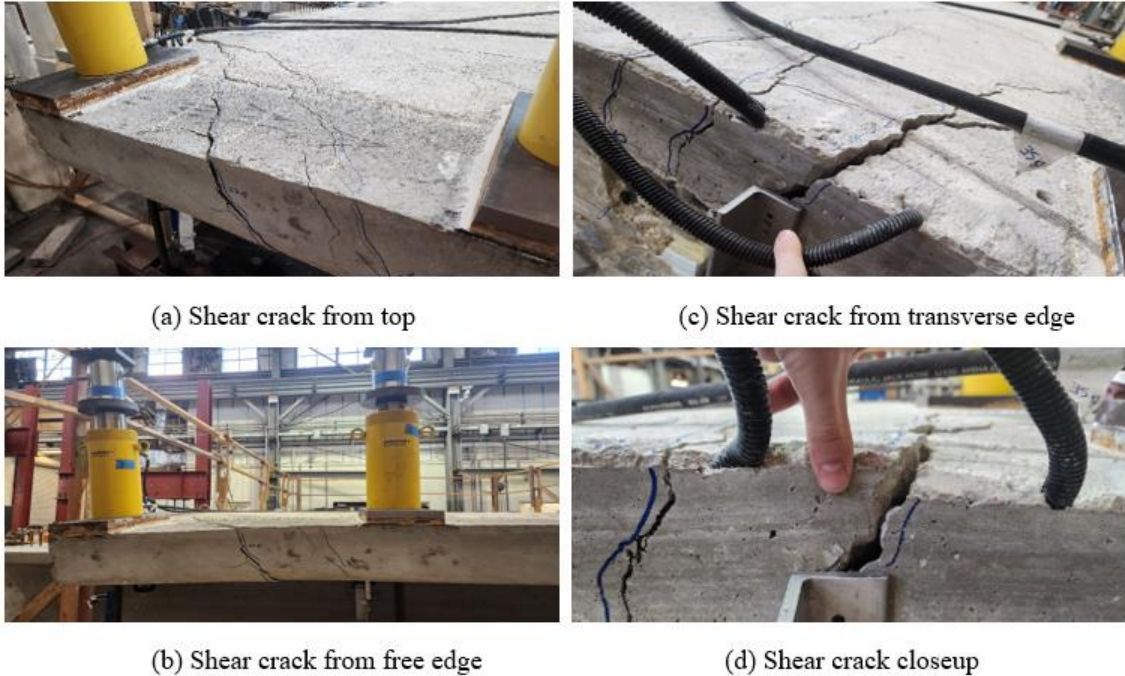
Test 10 – Electro-Welded Panel Pair Long Overhang – Shear Crack at Ultimate Load
